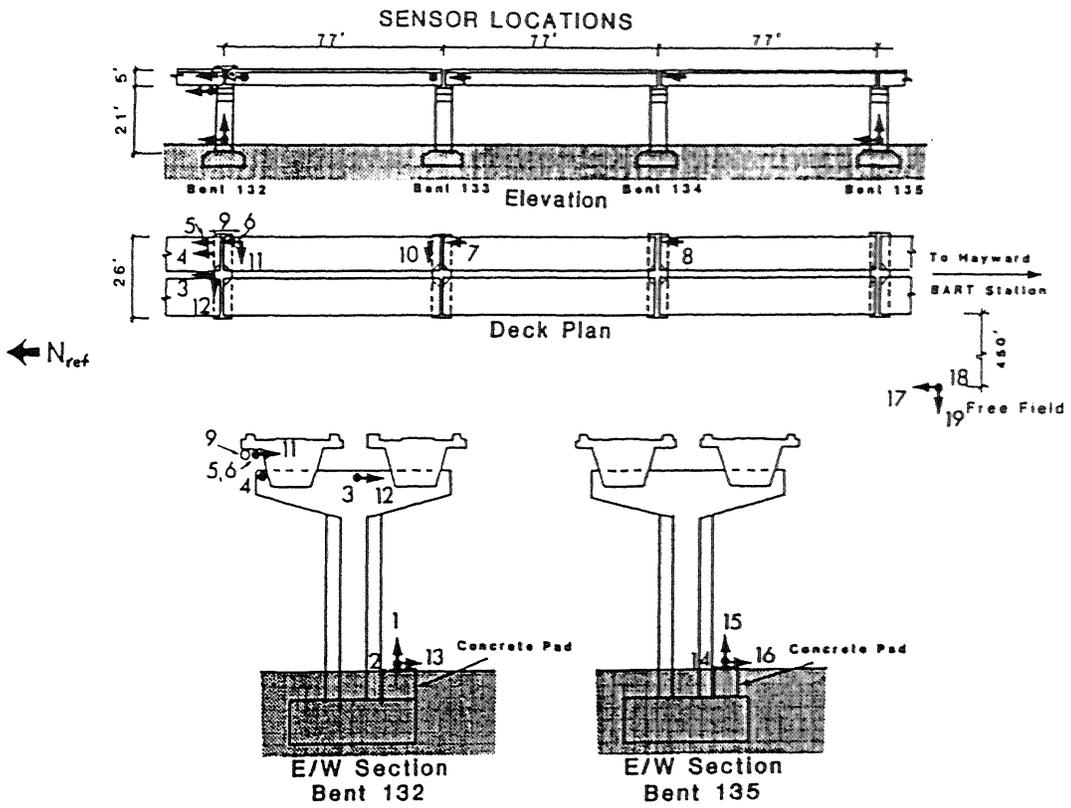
Structure Configuration of Hayward-BART Elevated Section and Sensor Locations
